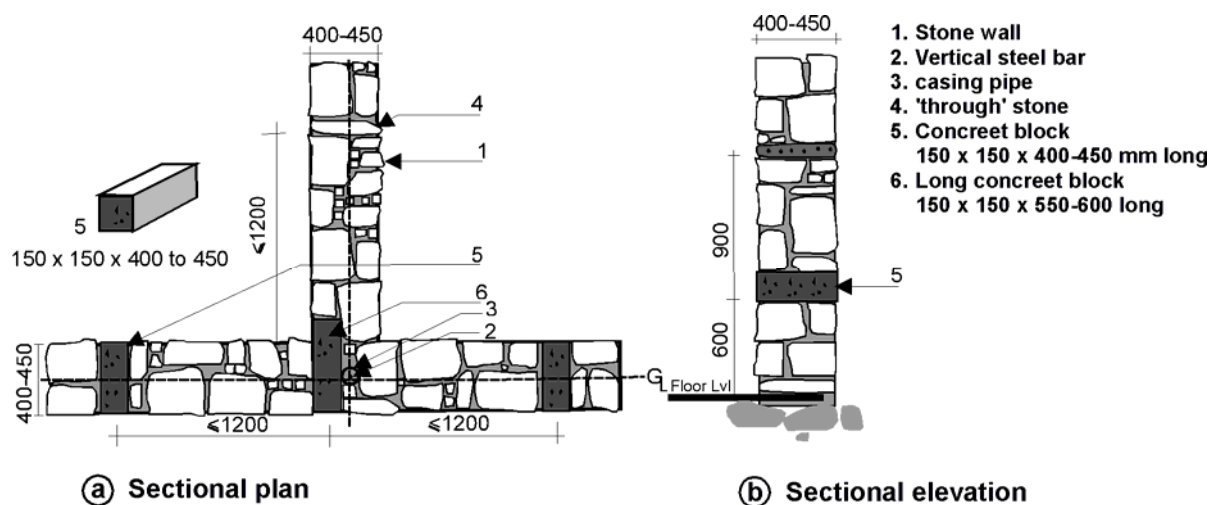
'Through' stone or bond elements in stone wall built in mud mortar
